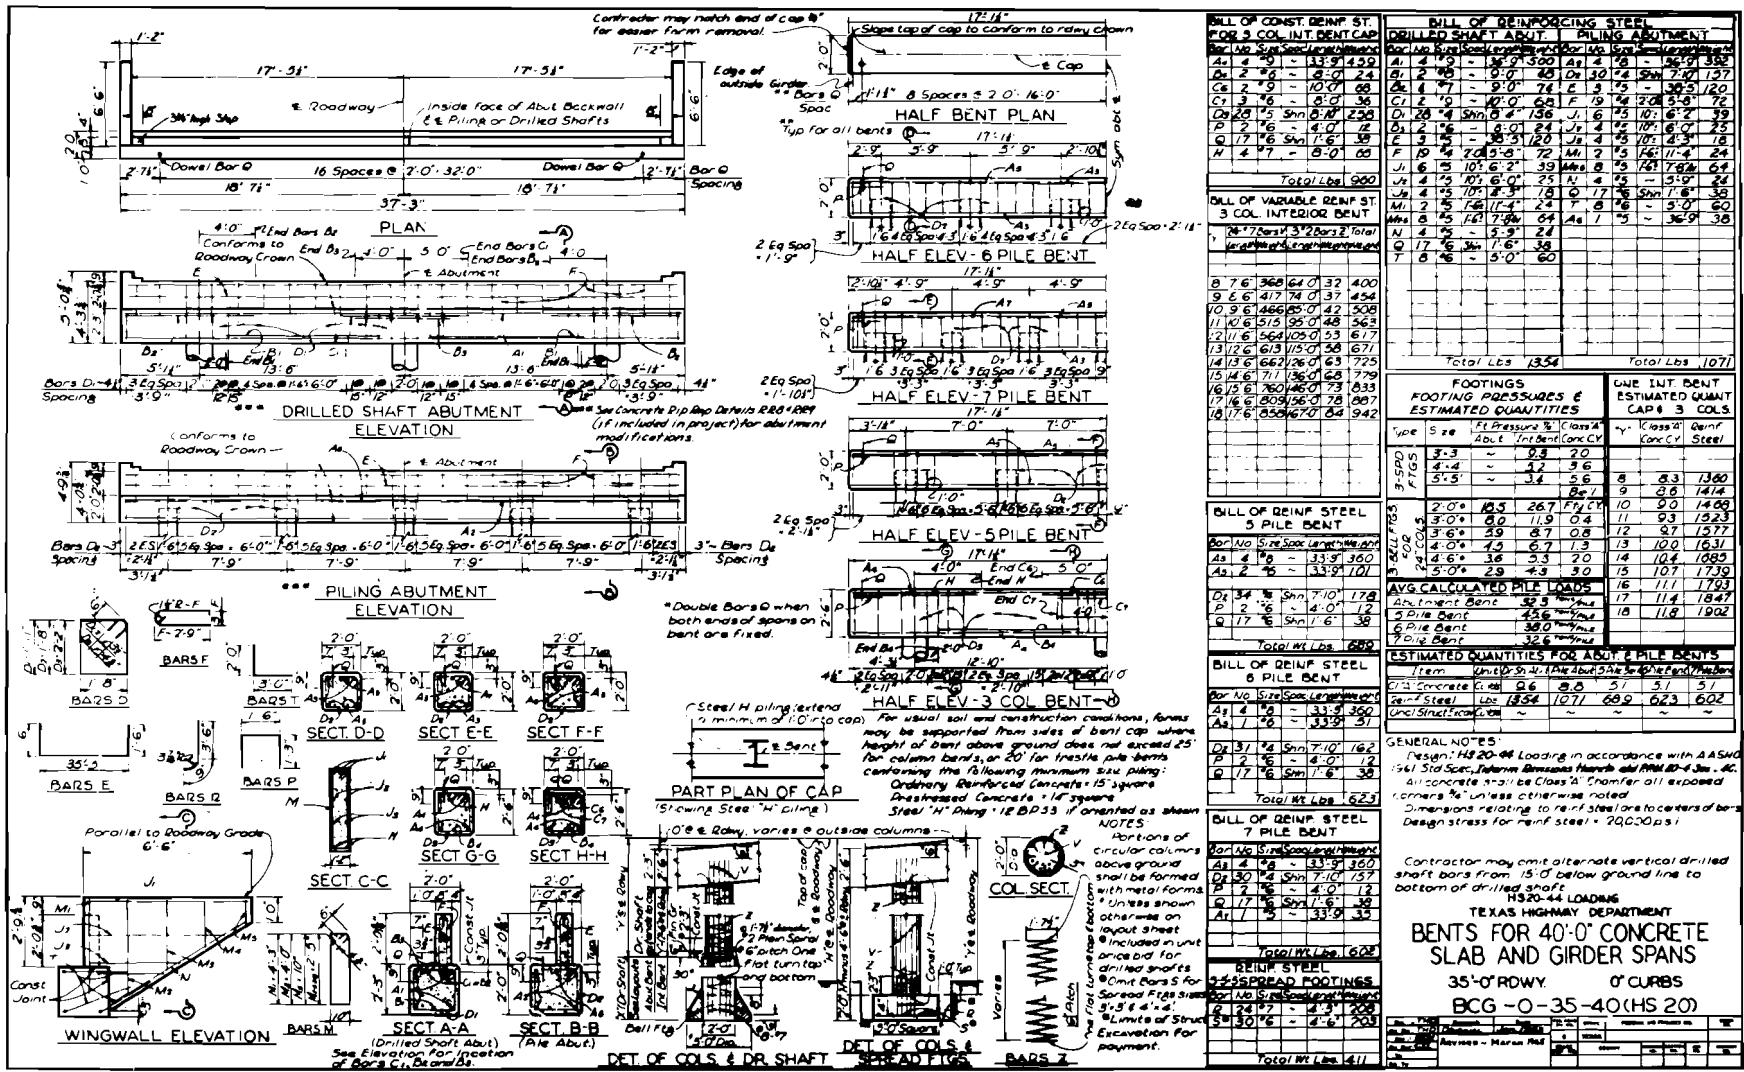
Texas Highway Department Plan Sheet, BCG-0-35-40.
